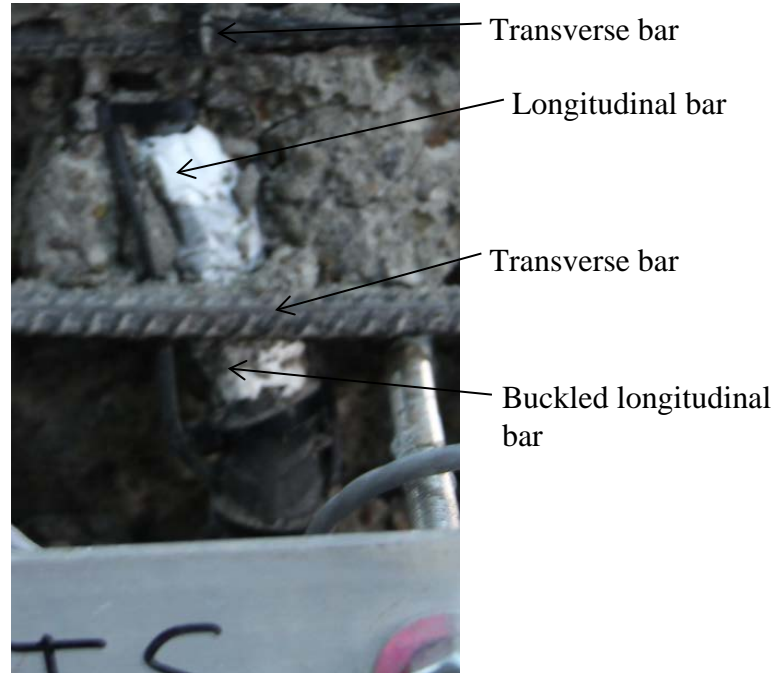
Column C5 initial buckling of longitudinal reinforcing bar
